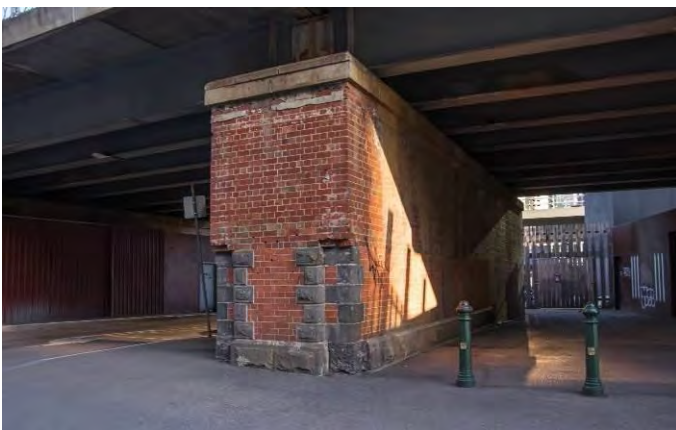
Bluestone foundation and quoining evident in one of the substructure. (Source: Context 2019)
